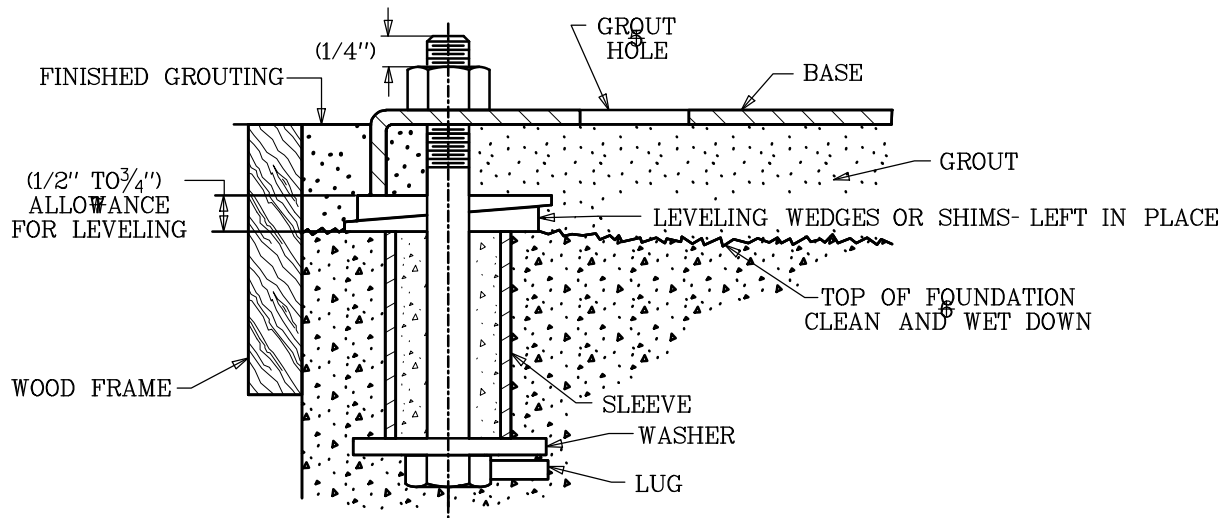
TYPICAL FOUNDATION BOLT DESIGN
